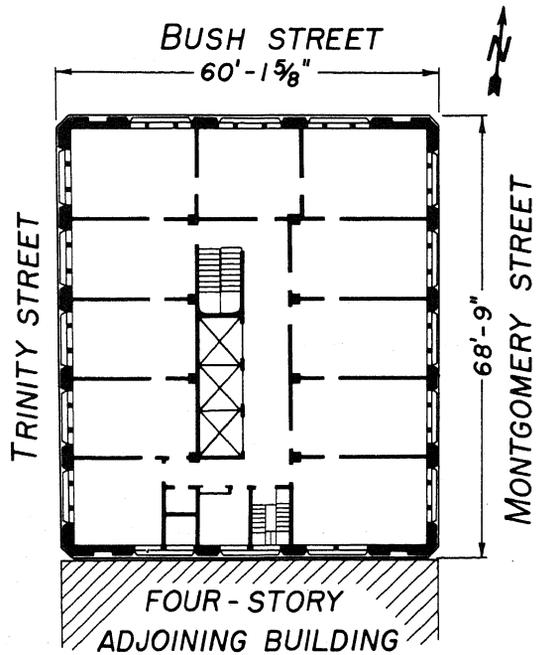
TYPICAL FLOOR PLAN OF THE ALEXANDER BLDG.
